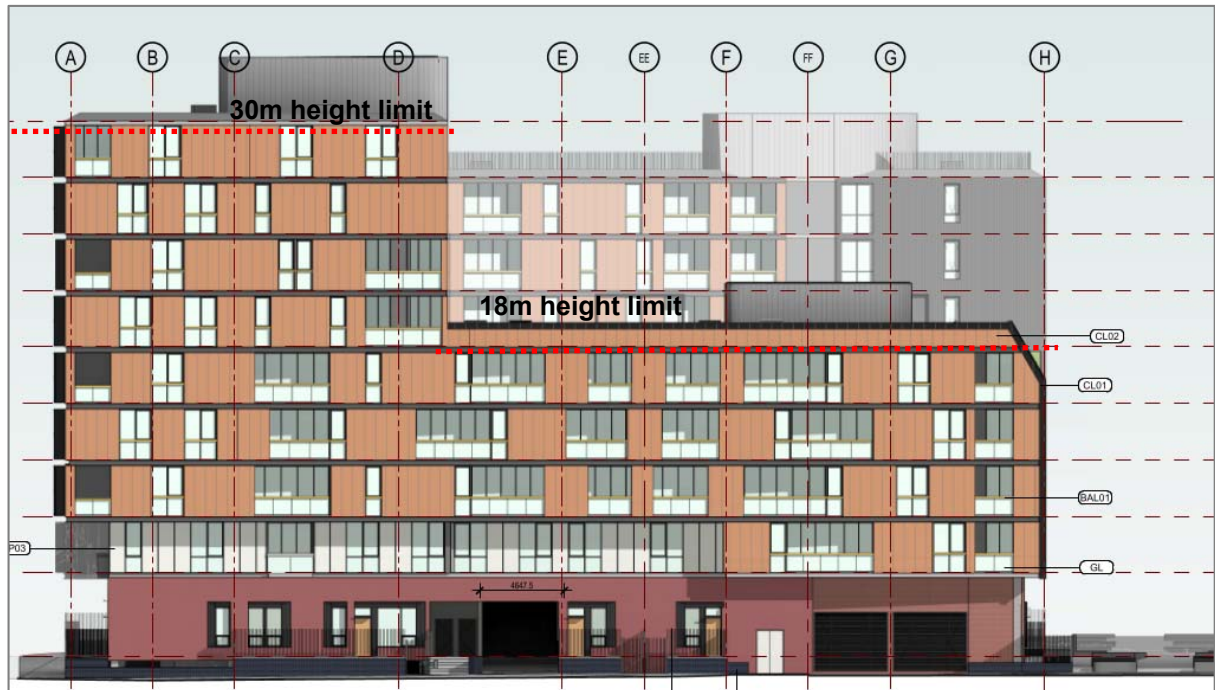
Proposed Building B (southern, Rose Valley Way elevation) demonstrating breach of 18m height control (from new public domain ground floor level)
